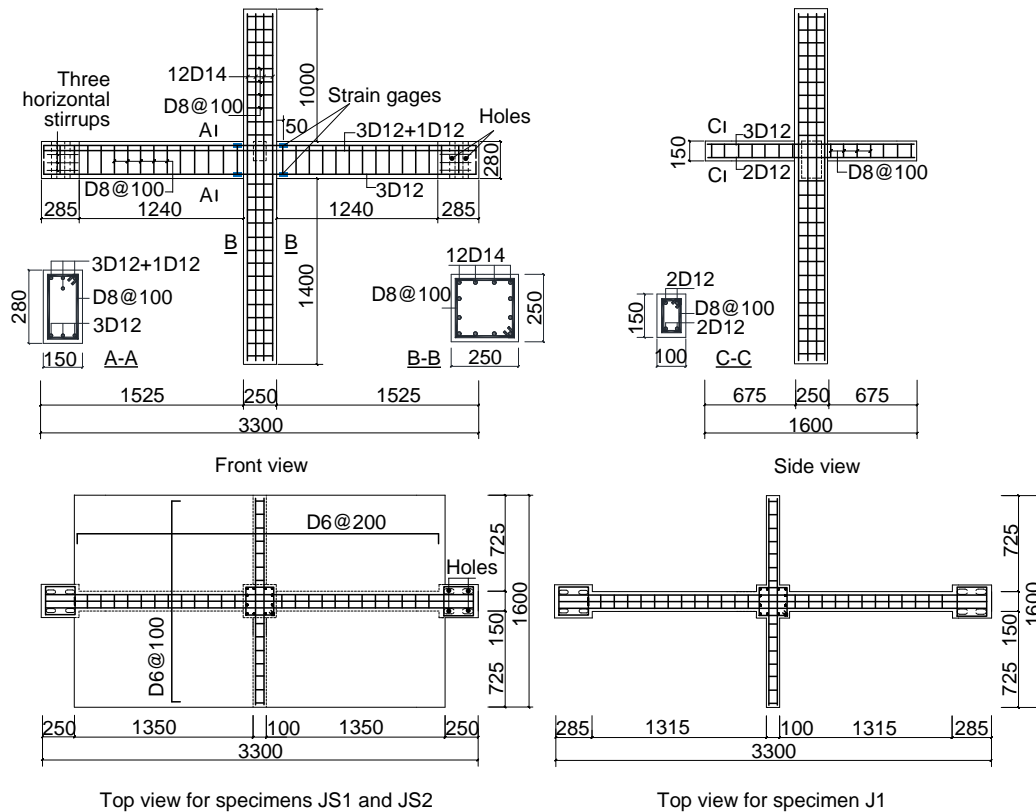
Geometries and reinforcements of the original specimens JS1, JS2 and J1
